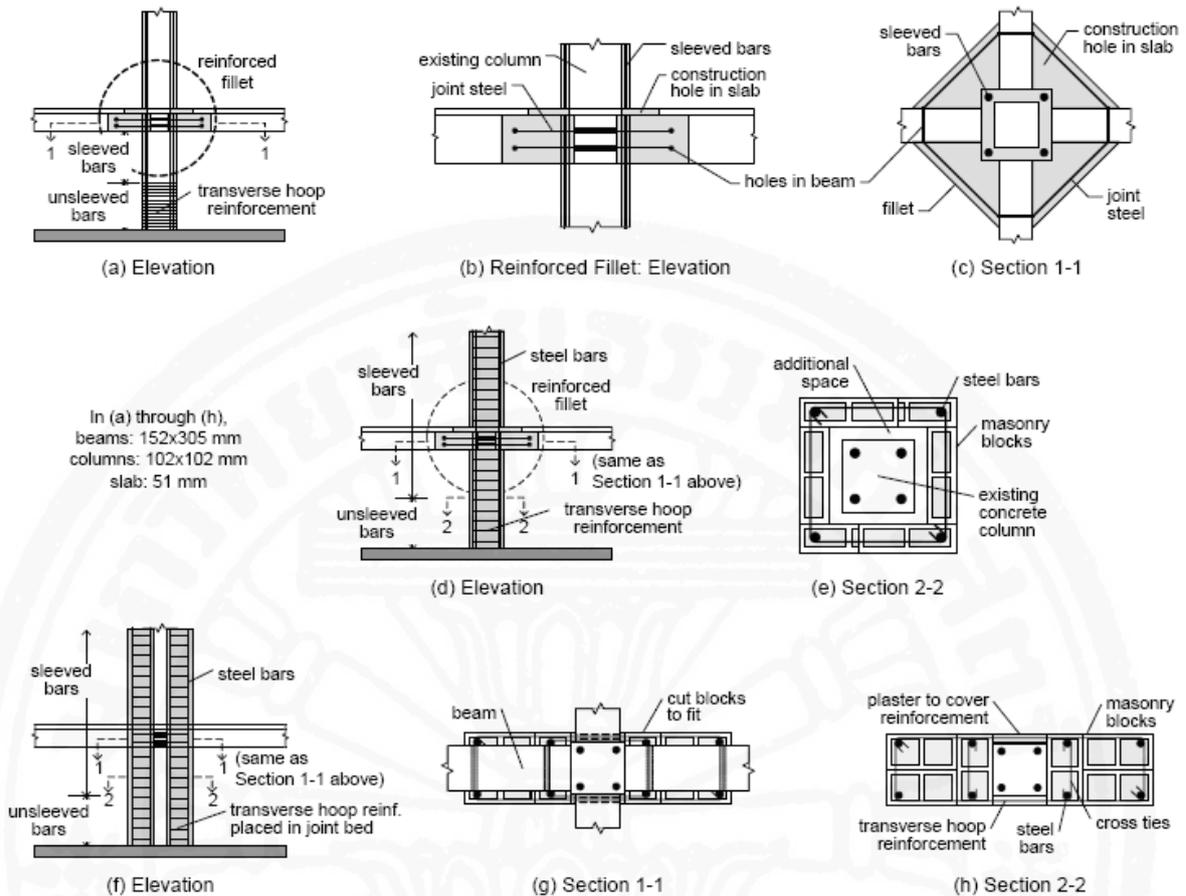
Retrofit techniques studied by Bracci et al. (1995): (a, b, c) prestressed concrete jacketing, (d, e) masonry block jacketing, (f, g, h) partial masonry infill.
